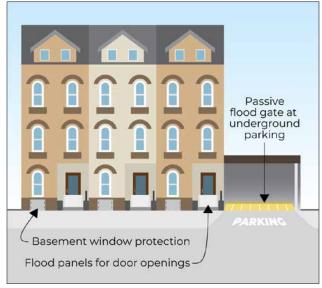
EXAMPLES OF DRY FLOODPROOFING FOR CONDO ASSOCIATIONS
